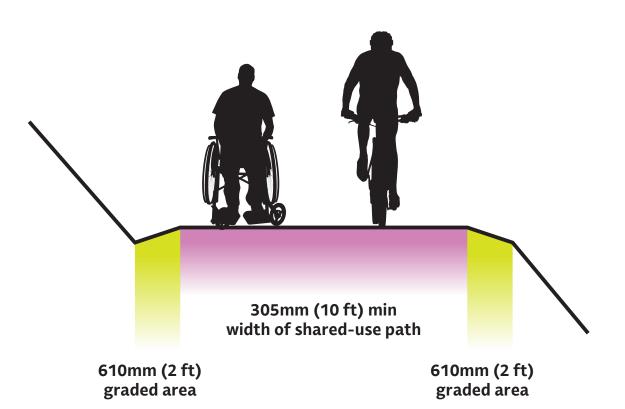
Shared use paths should be constructed to minimum widths of 10 feet image
